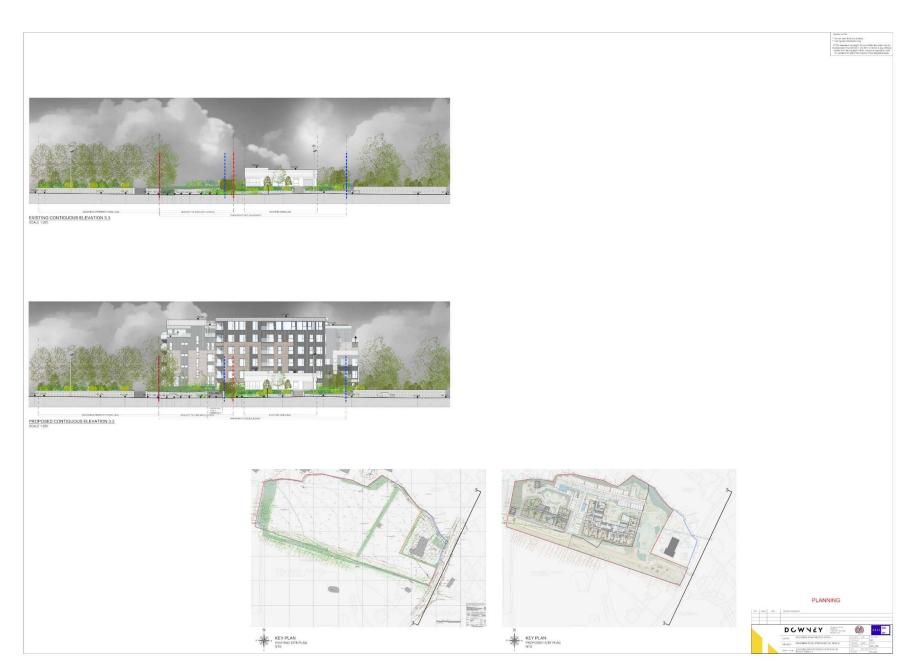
Existing and Proposed Contiguous Elevations 3.3
